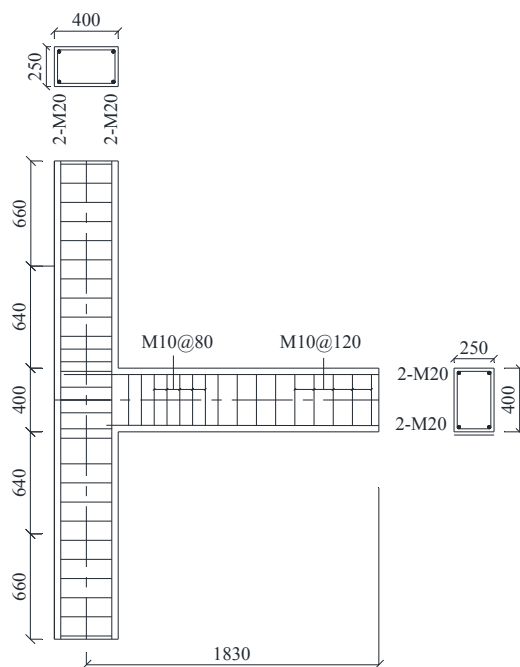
Details of the two BCJs tested by Youssef et al. (2008)
